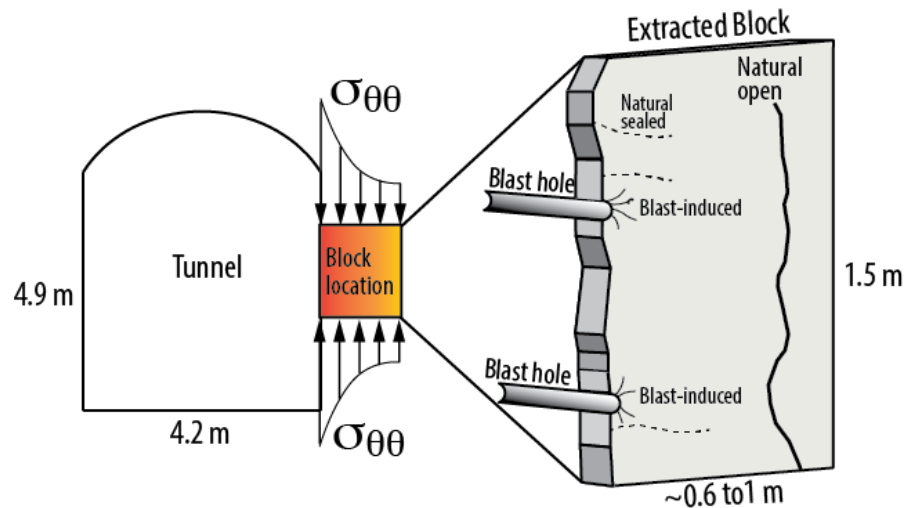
Typical fracture patterns of rock blocks excavated from tunnel wall.
